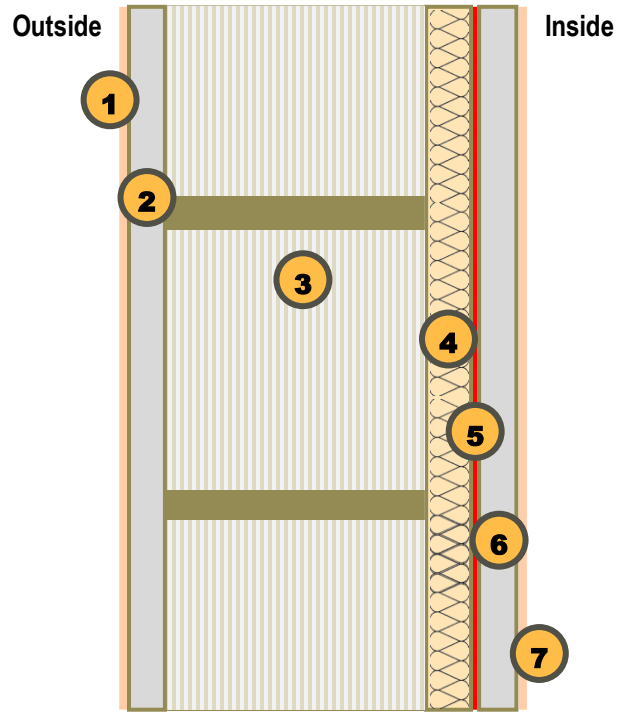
Construction detail for wall assembly: Solid concrete block with internal insulation
